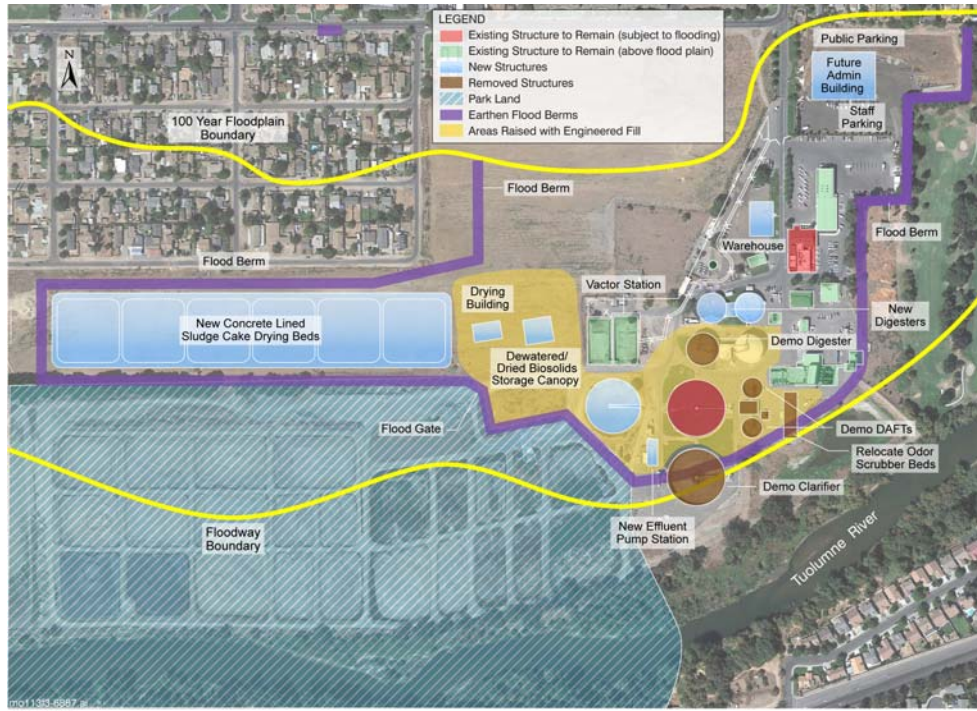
Facility Layout Plan – Scenario B (Land Acquisition from TRRP)
